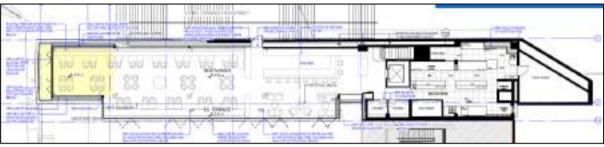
Works Plan extract (Source: BJB Architects, 2024)
